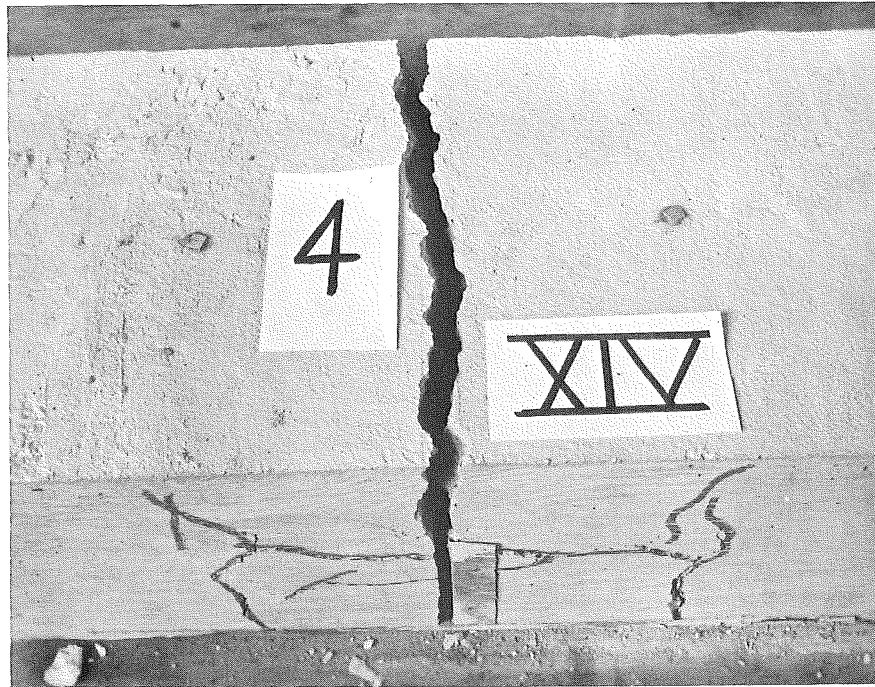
C - FAILURE OF SPECIMEN XIV (SET E)
